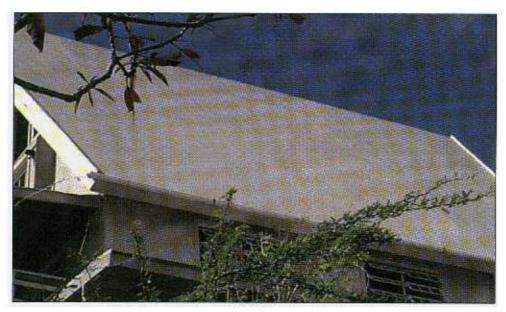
This house had a liquid-applied membrane over plywood roof sheathing. This type of roof system typically offered excellent wind performance provided the plywood does not lift. This house was located on the island of Culebra.
